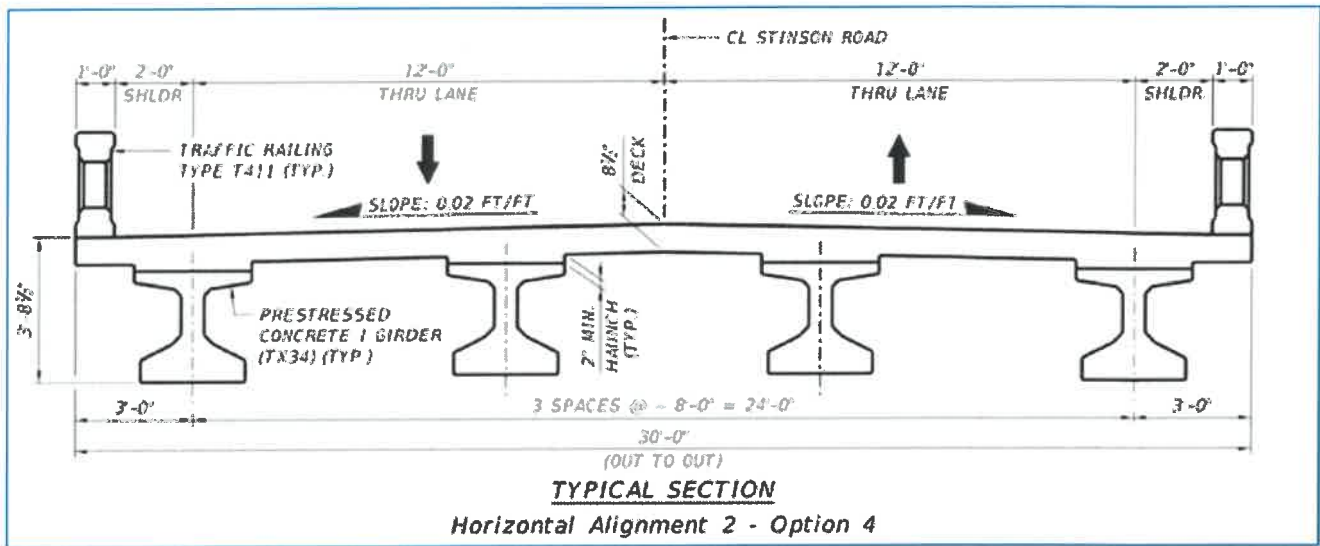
TxDOT Prestressed Concrete I-Girders (TX34) Typical Section
